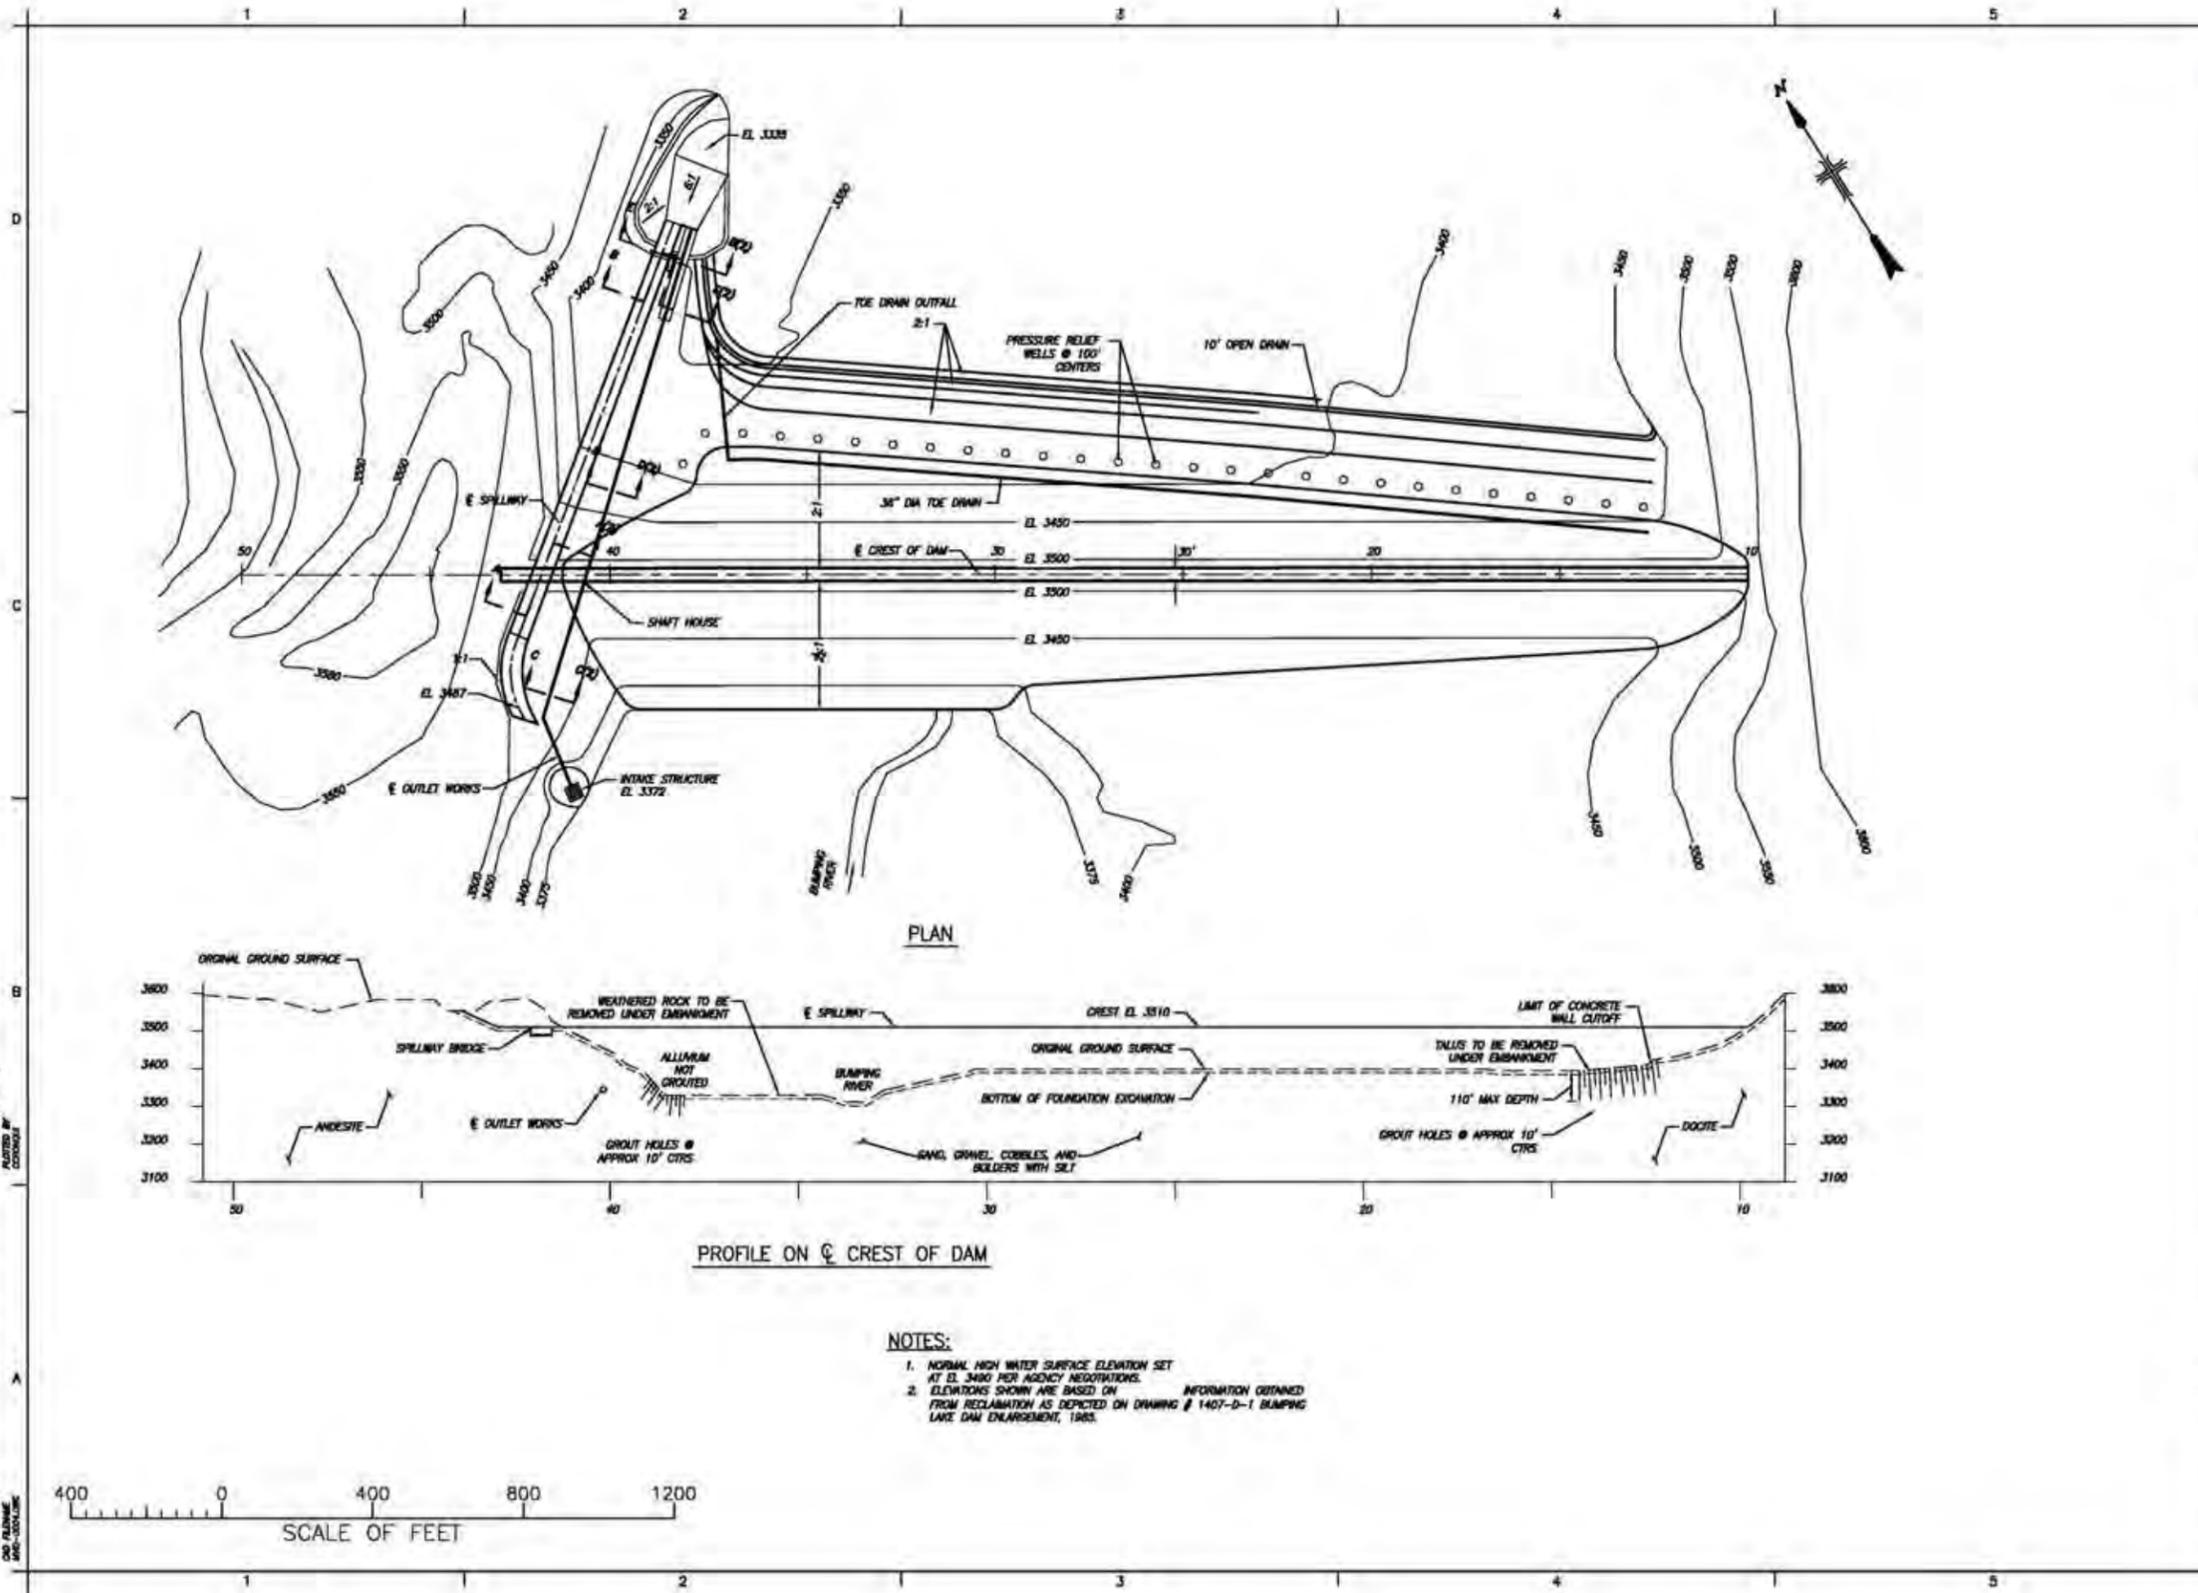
D-1, Bumping Reservoir Planning Design, Sheet 1 of 2
